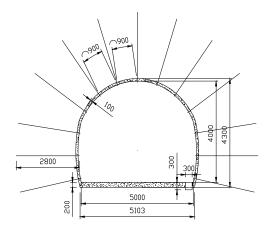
Sectional Drawing of Tunnel Retainment & Support-System
